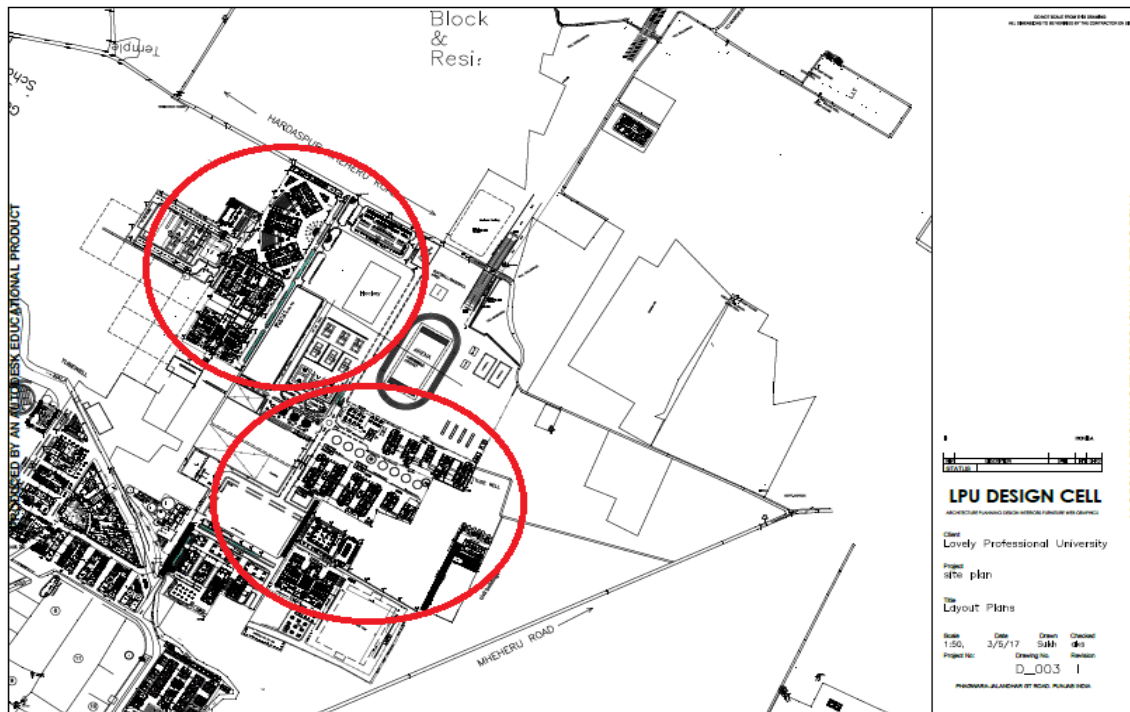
Area covered by closely spaced buildings and parking
